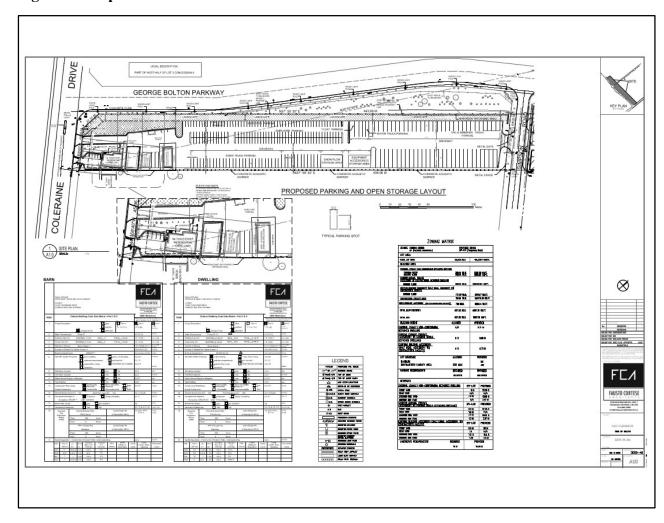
Proposed Site Plan 12423 Coleraine Drive
